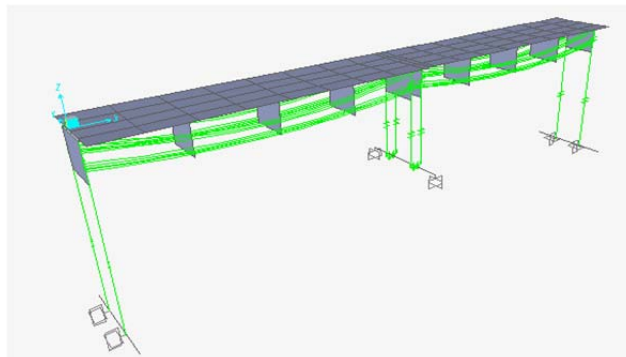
Snapshot of 3D modelling of existing Railway Bridge
